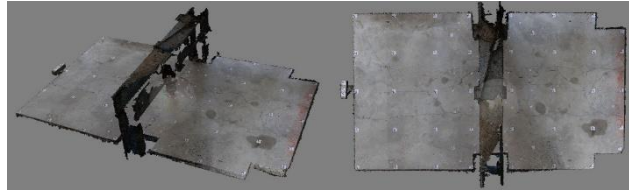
Three Dimensional Point Cloud Reconstruction Effect of Box Girder Specimen
